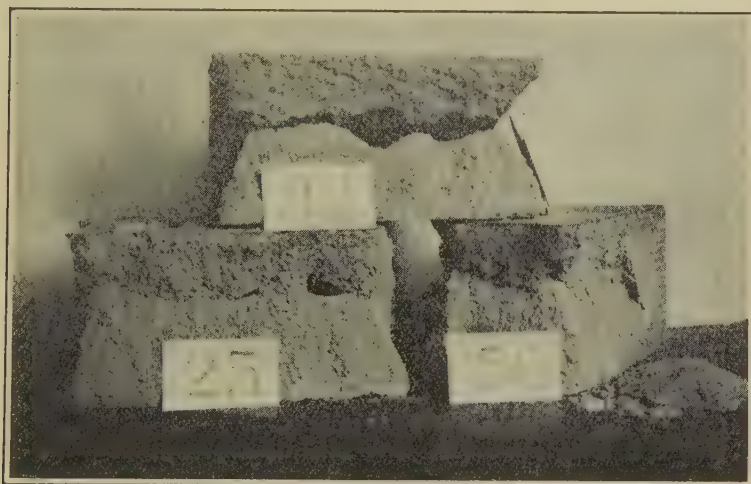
TYPICAL FAILURES OF SPECIMENS SHOWING CONICAL SHEAR.
